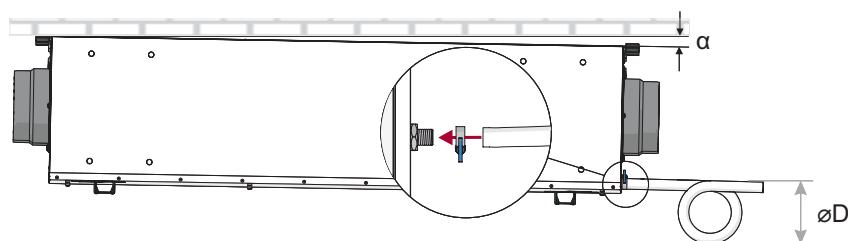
Drainage system installation (øD=150 mm)
